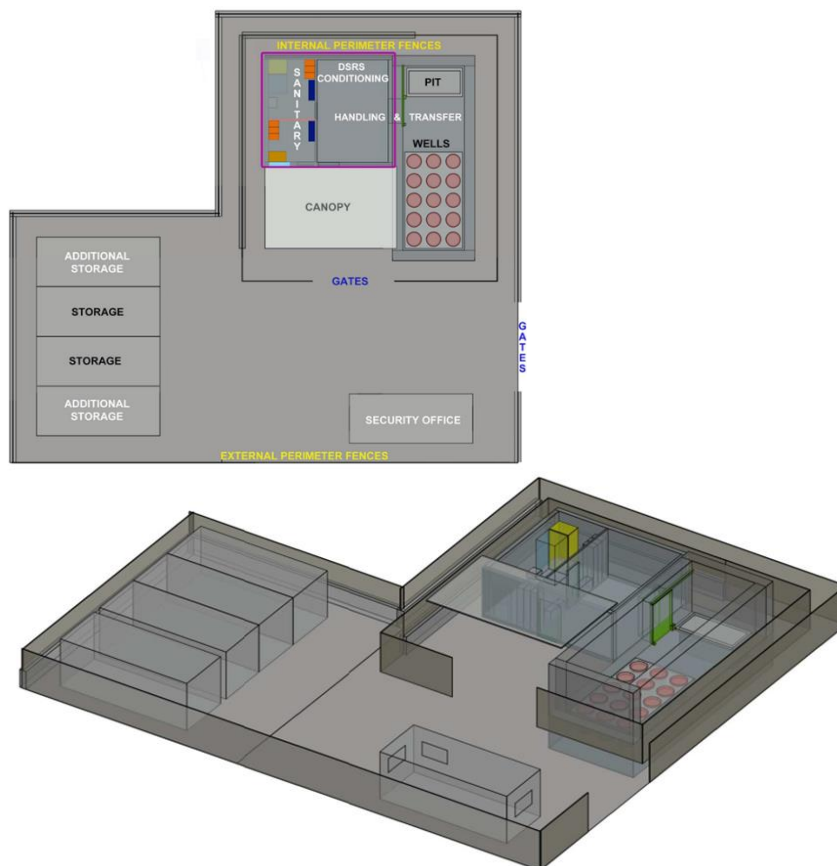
Upgraded RWSF Rakovica generic layout & 3D model
